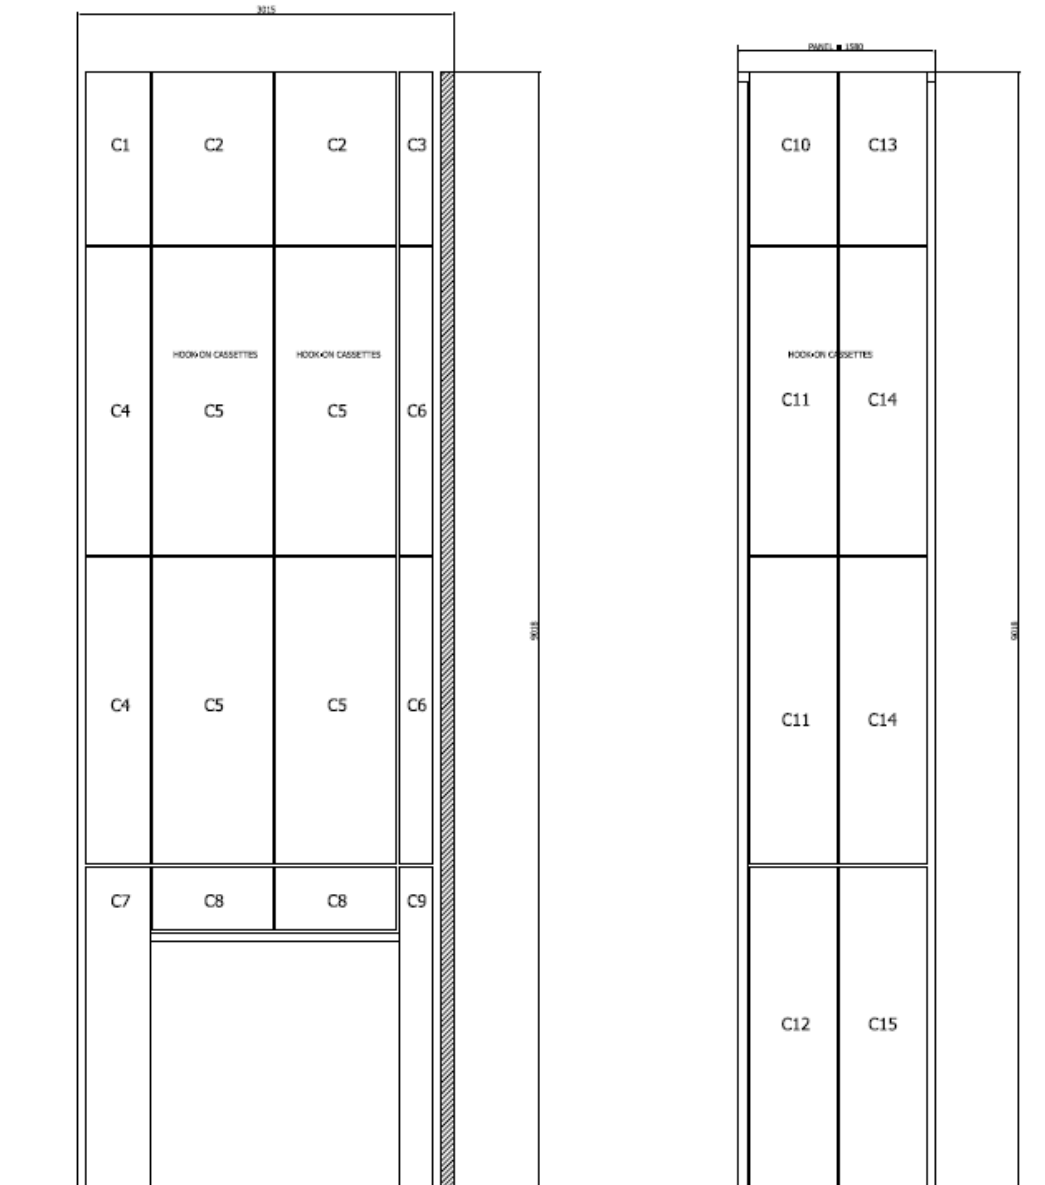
Construction of the System showing the layout of BENCHMARK wall liner panels.
